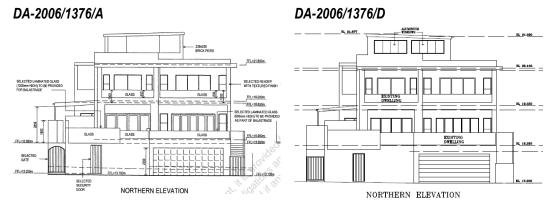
Approved dwelling house (left) and as-constructed dwelling house (right).
